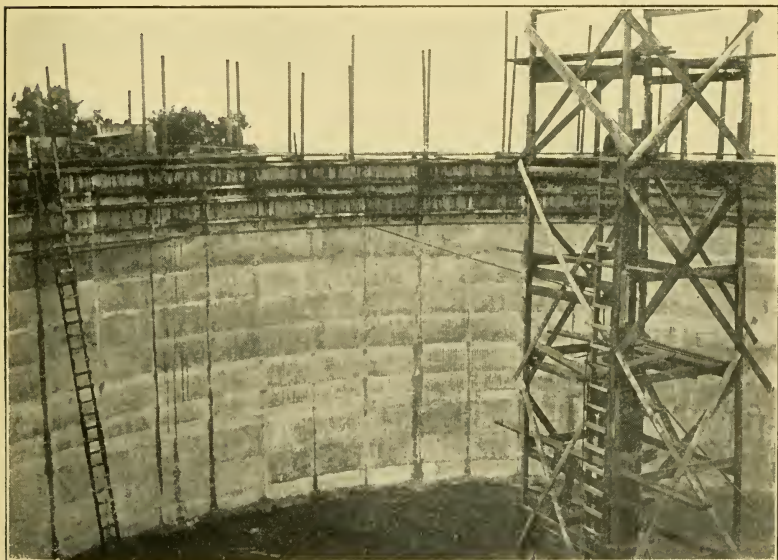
INTERIOR OF WALL DURING CONSTRUCTION.
